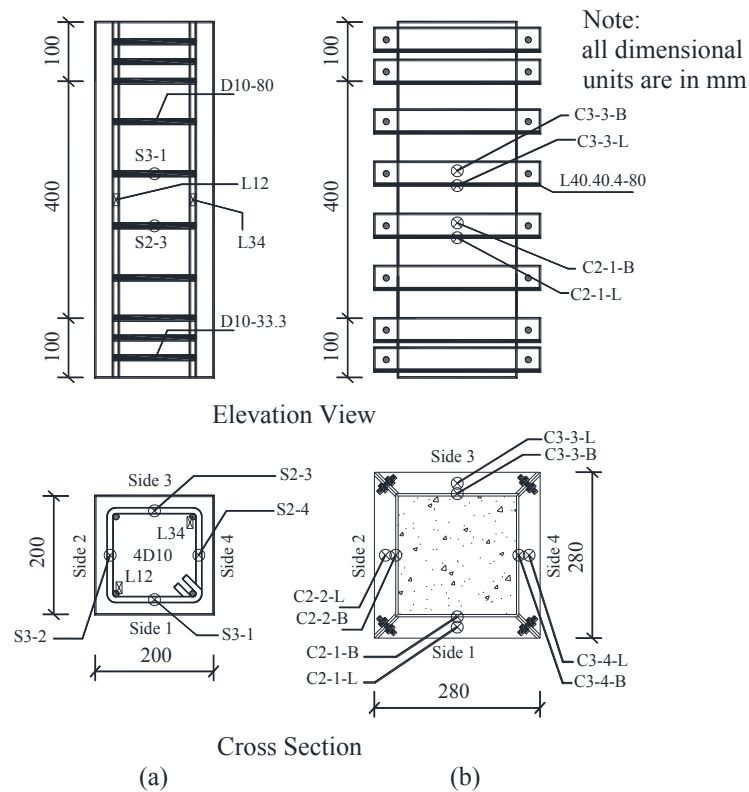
Elevation view and cross section of Specimen S04 : (a) reinforcement details ; and (b) external steel collars
